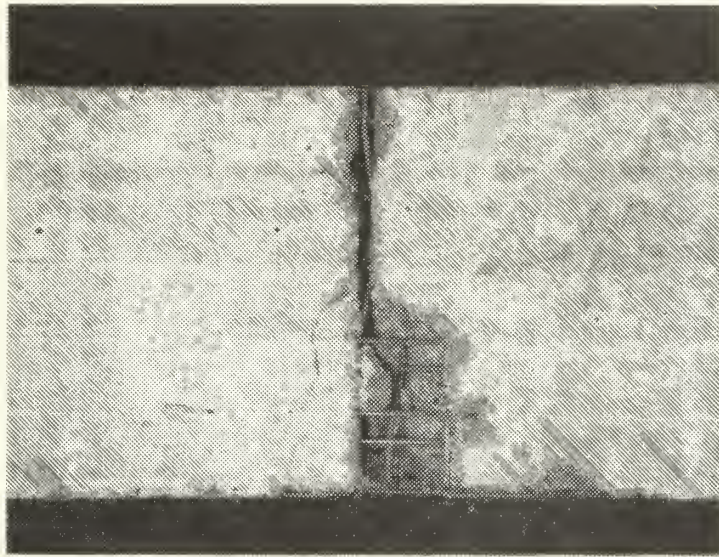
Close-Up of Fatigue Failure at Maximum Deflection of Three-Quarters of an Inch
